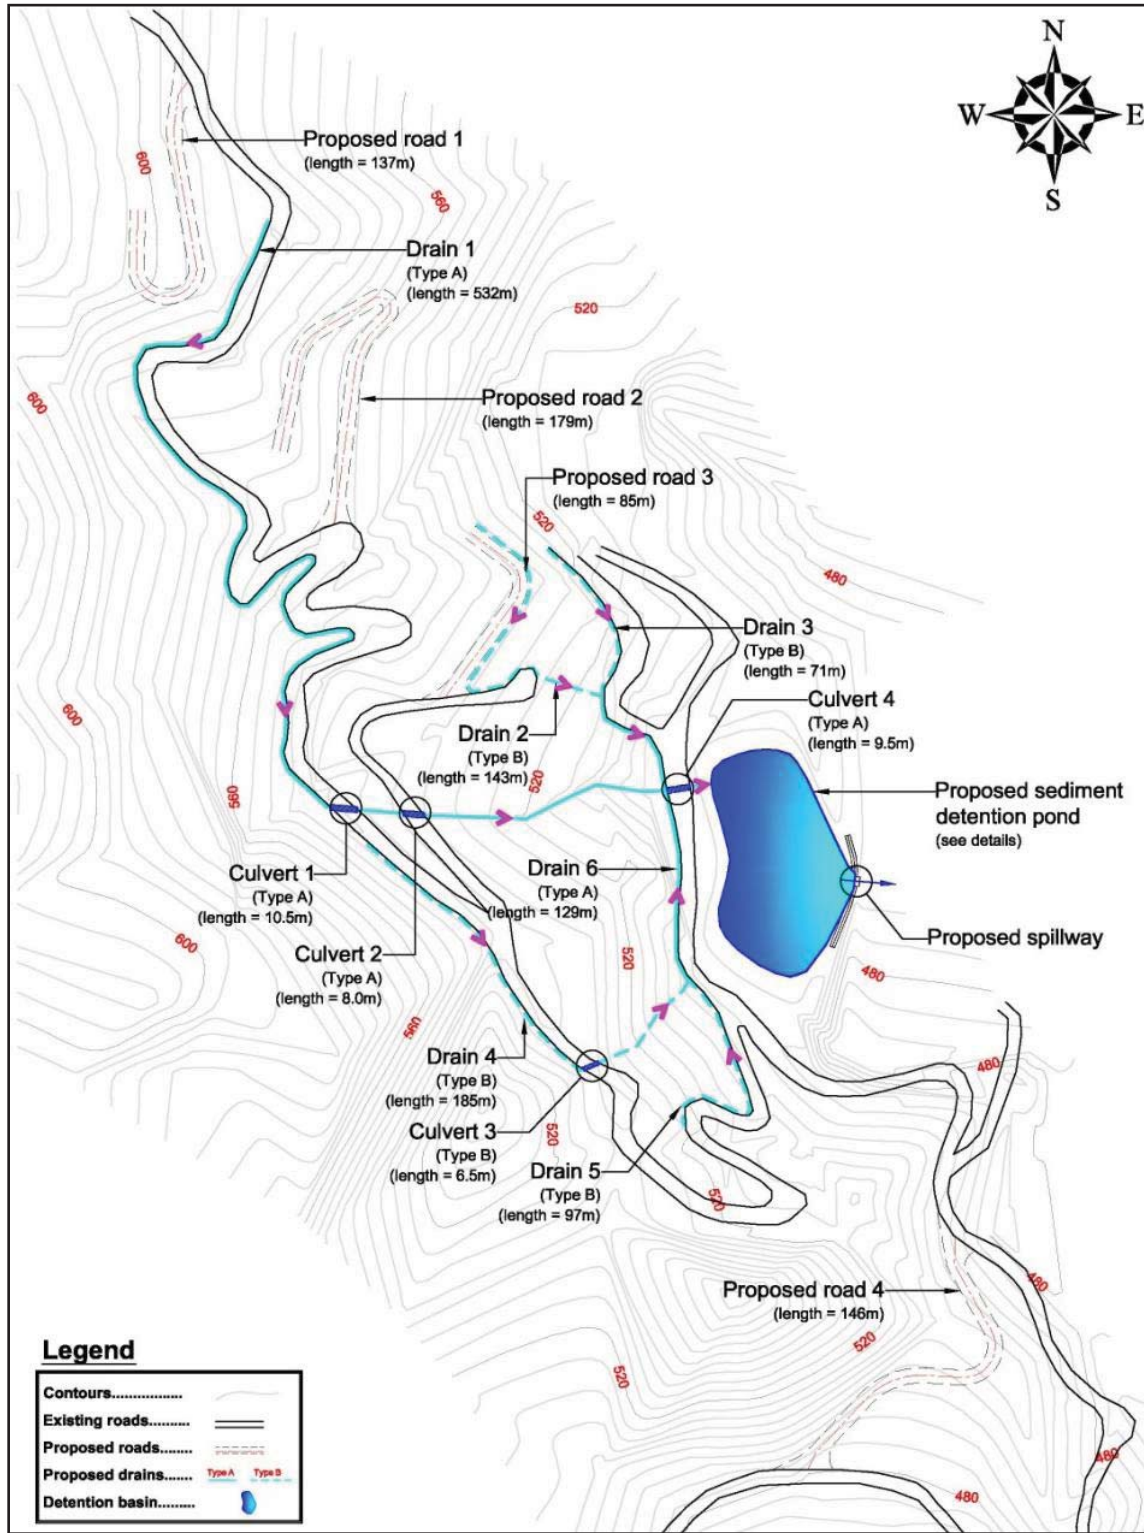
Proposed layout of drainage including earth swales, culvert crossings and detention pond
